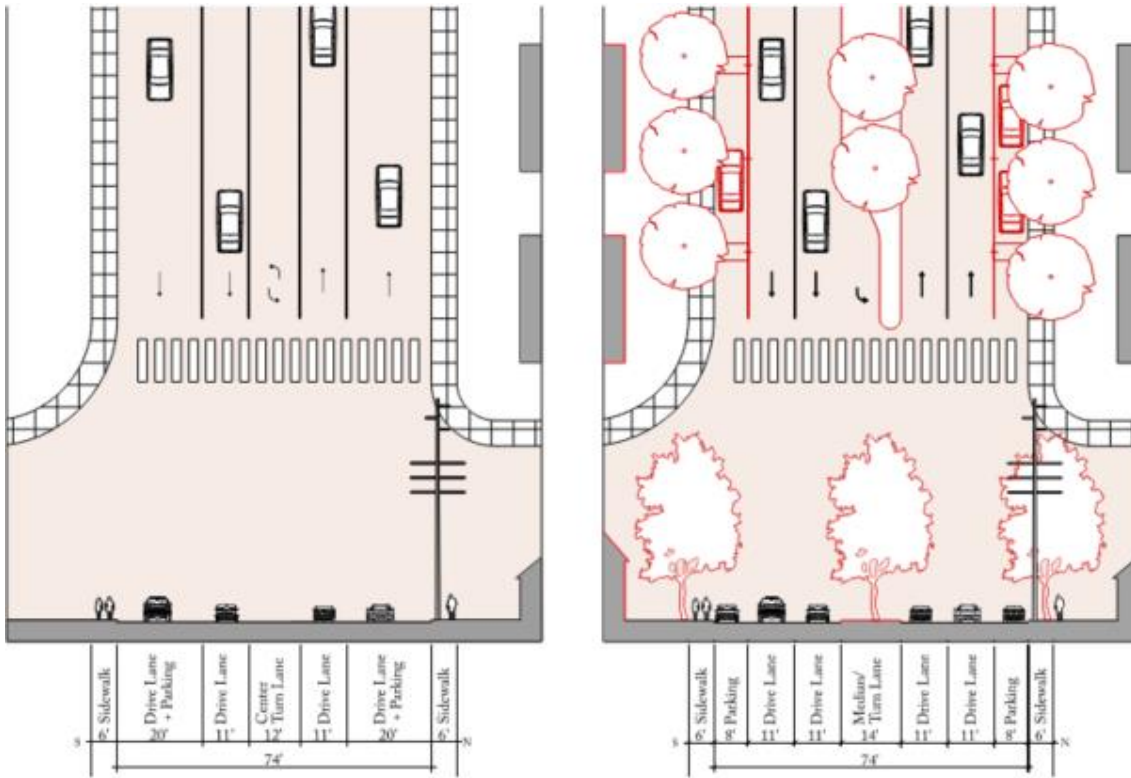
Greenwood Avenue -- South of Washington Boulevard
